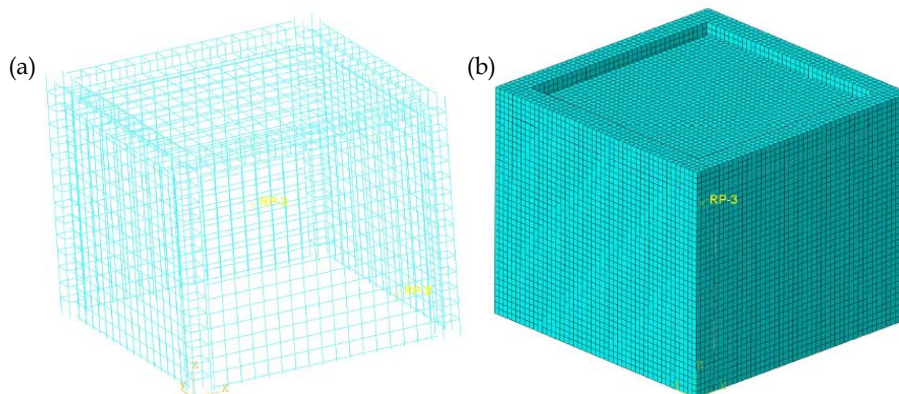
Profile of building (a) reinforcement and (b) concrete
